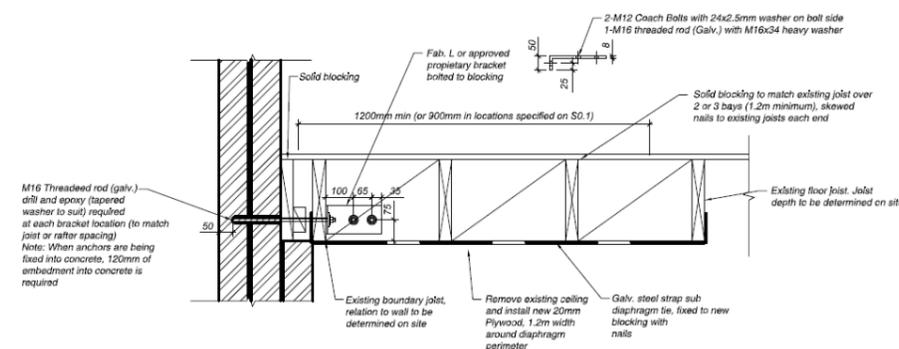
Diaphragm to Wall typical remedial detail - Joist Parallel
